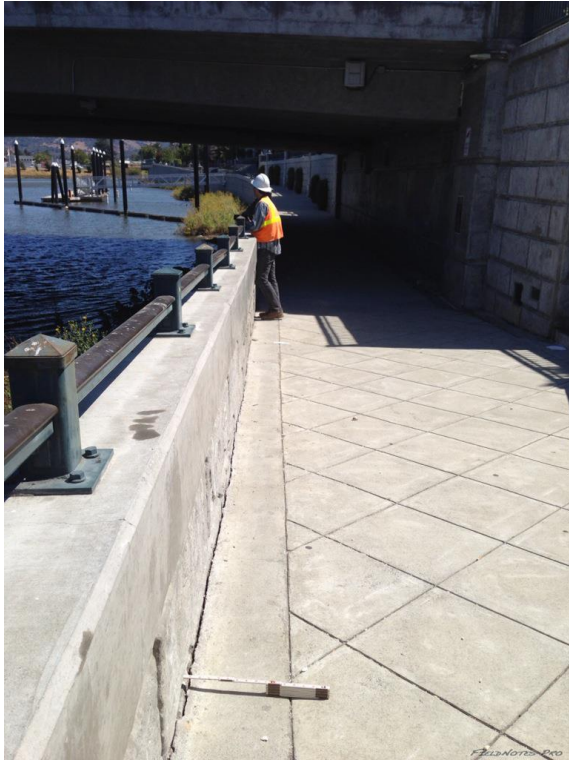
Crack parallel to the River in West abutment of 3rd St. Bridge [NSF-GEER; N 38.2980 W -122.2840; 08/24/14 14:44]
